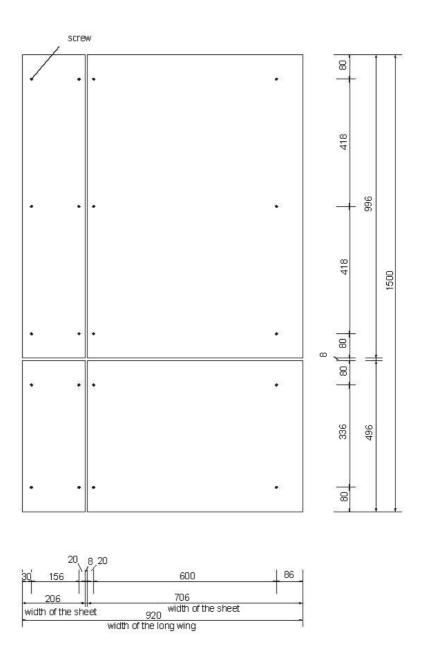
Mounting instructions for fibre cement sheets and the fixing - long wing
